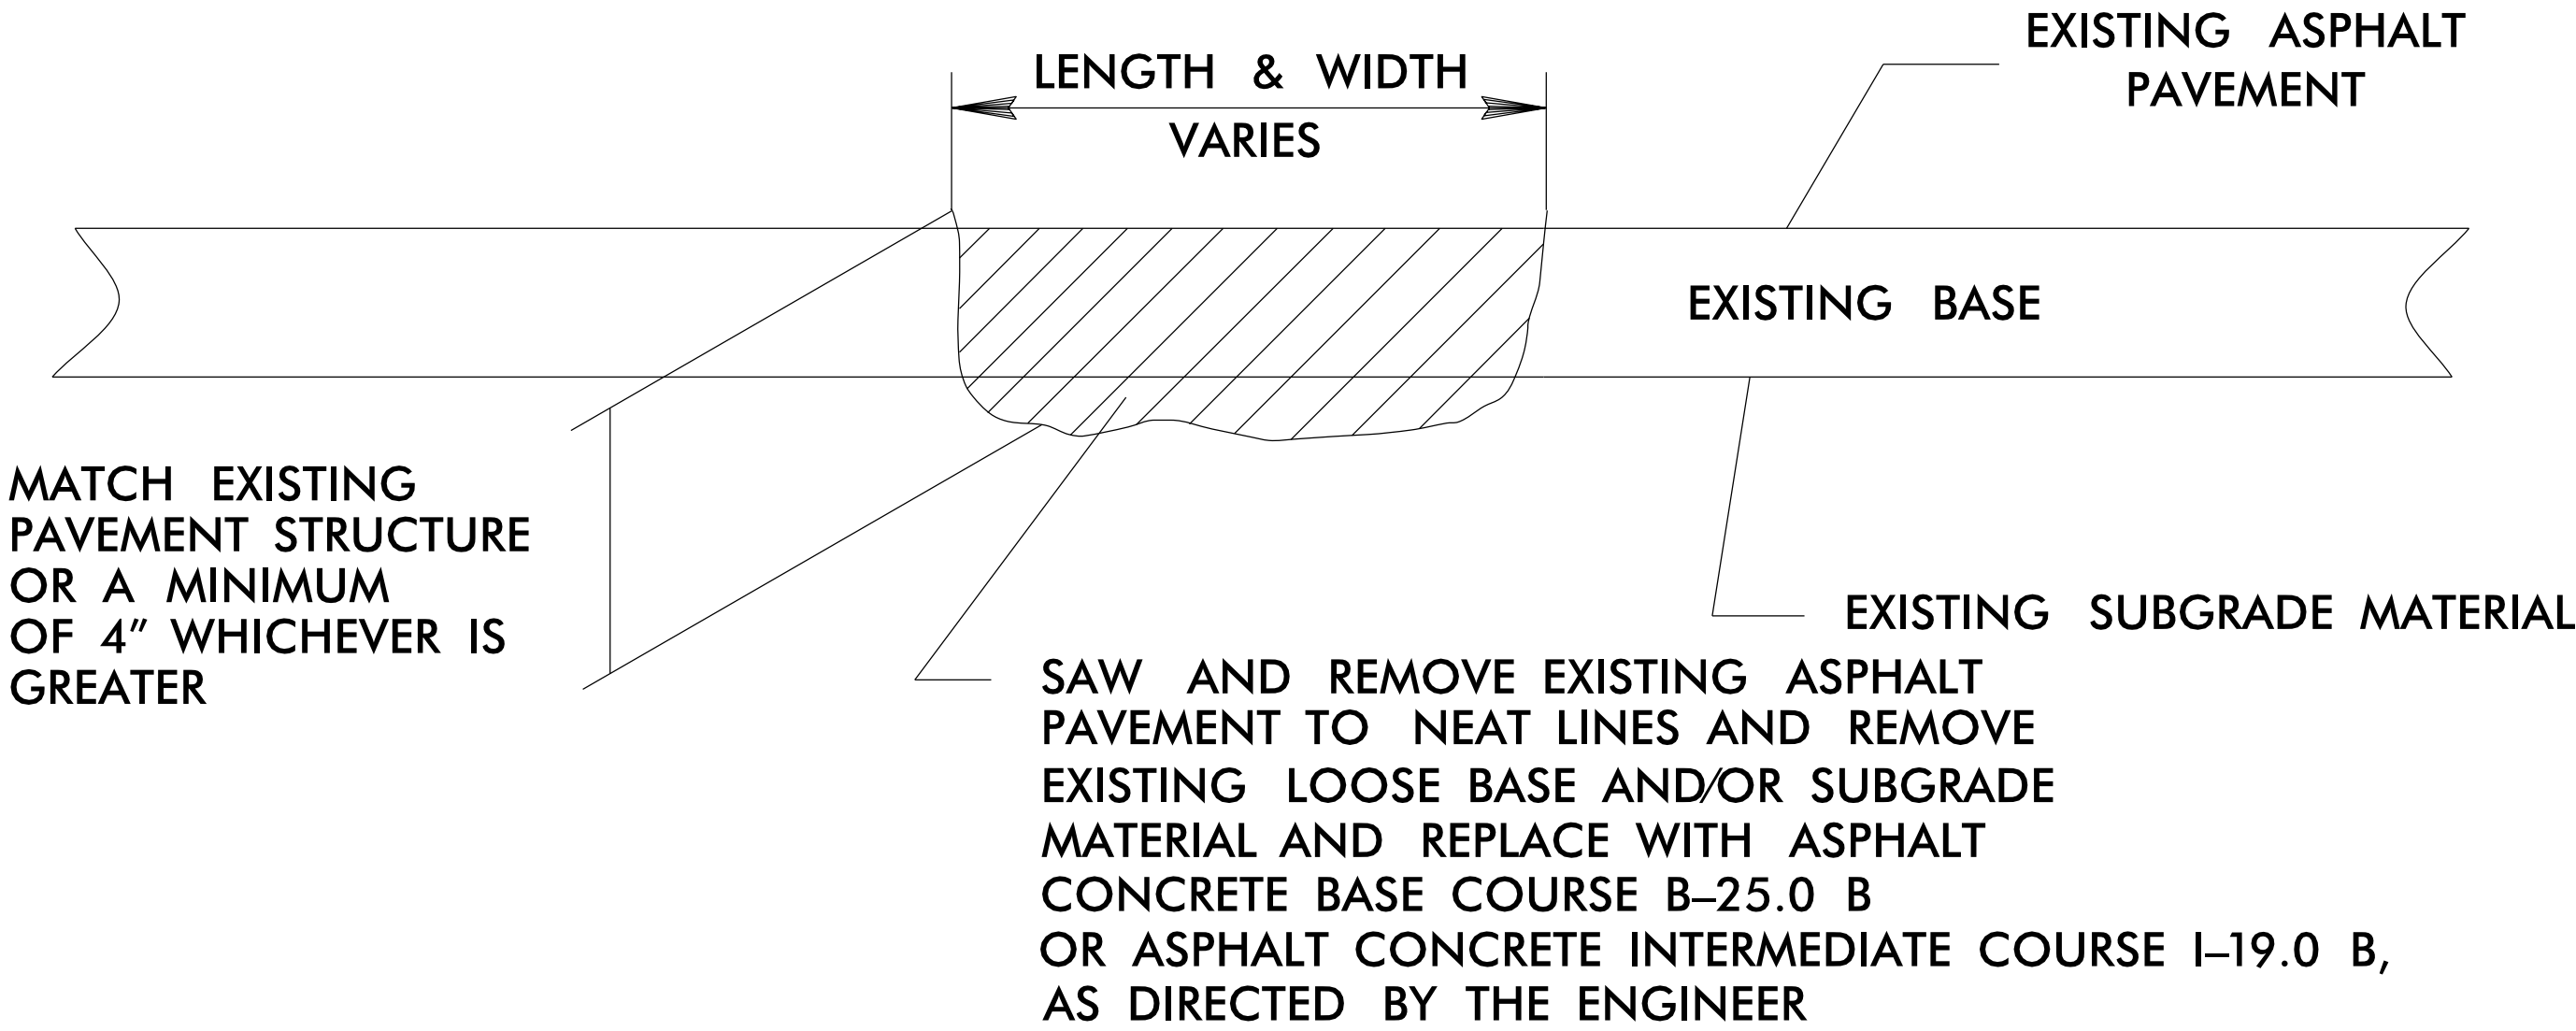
DETAILS OF PATCHING EXISTING PAVEMENT PRIOR TO RESURFACING
